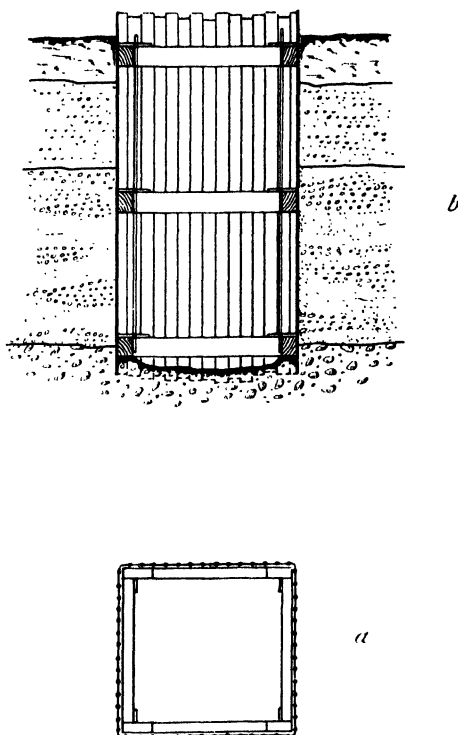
Test Pit with One Setting of Steel Piles. (a) Plan; (b) Section.
